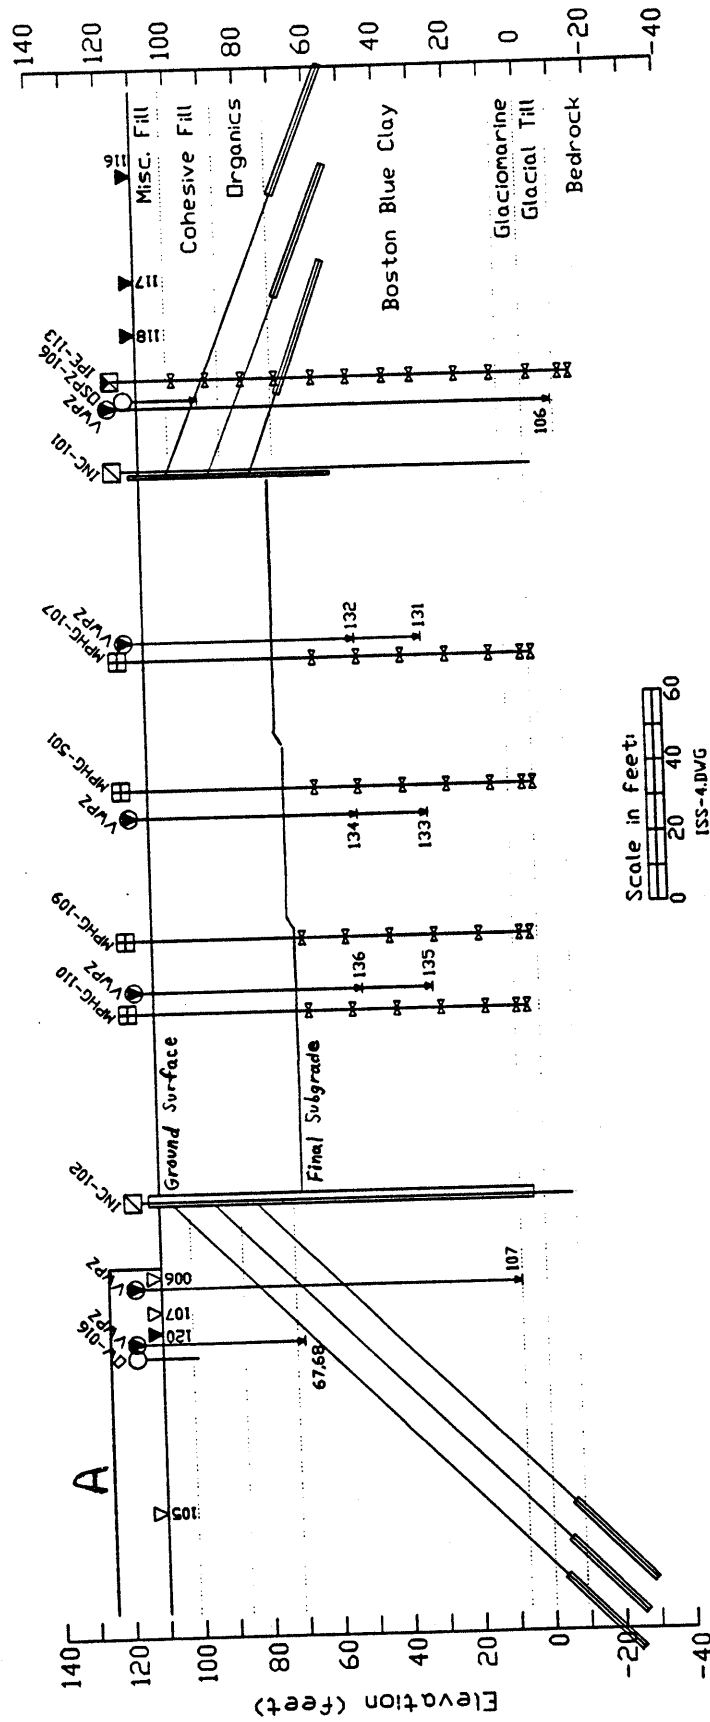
Cross-Sectional View of Excavation at ISS-4 Test Section (approx. Sta. 77+20), showing Tiebacks, SOE Walls, and Geotechnical Instrumentation. View is Looking East; North is to the Left.
